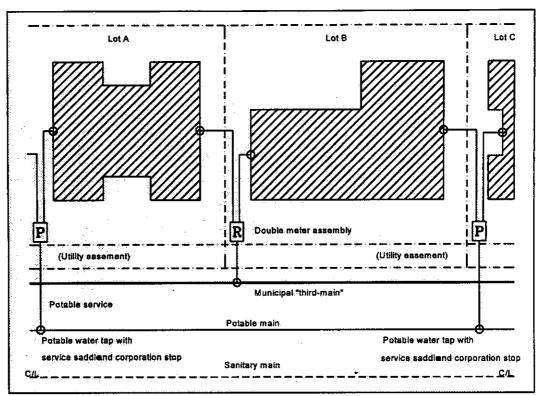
Typical site plan for double meter separation layout. Grosskopf, Kevin R. Water Reclamation and Reuse Within Multi-Level Structures. University of Florida, 1993.
